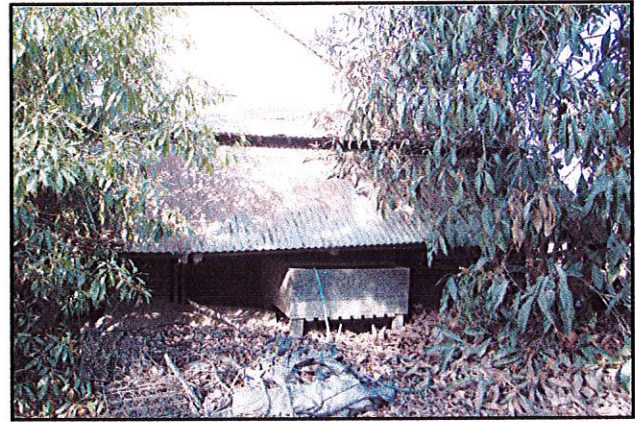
Shed addition to metal barn, ca. post-1904, located at the south end of the Ancillary Barns/Storage Building Group. This view is facing north, toward the south elevation. Photograph date, November 5, 2002.
